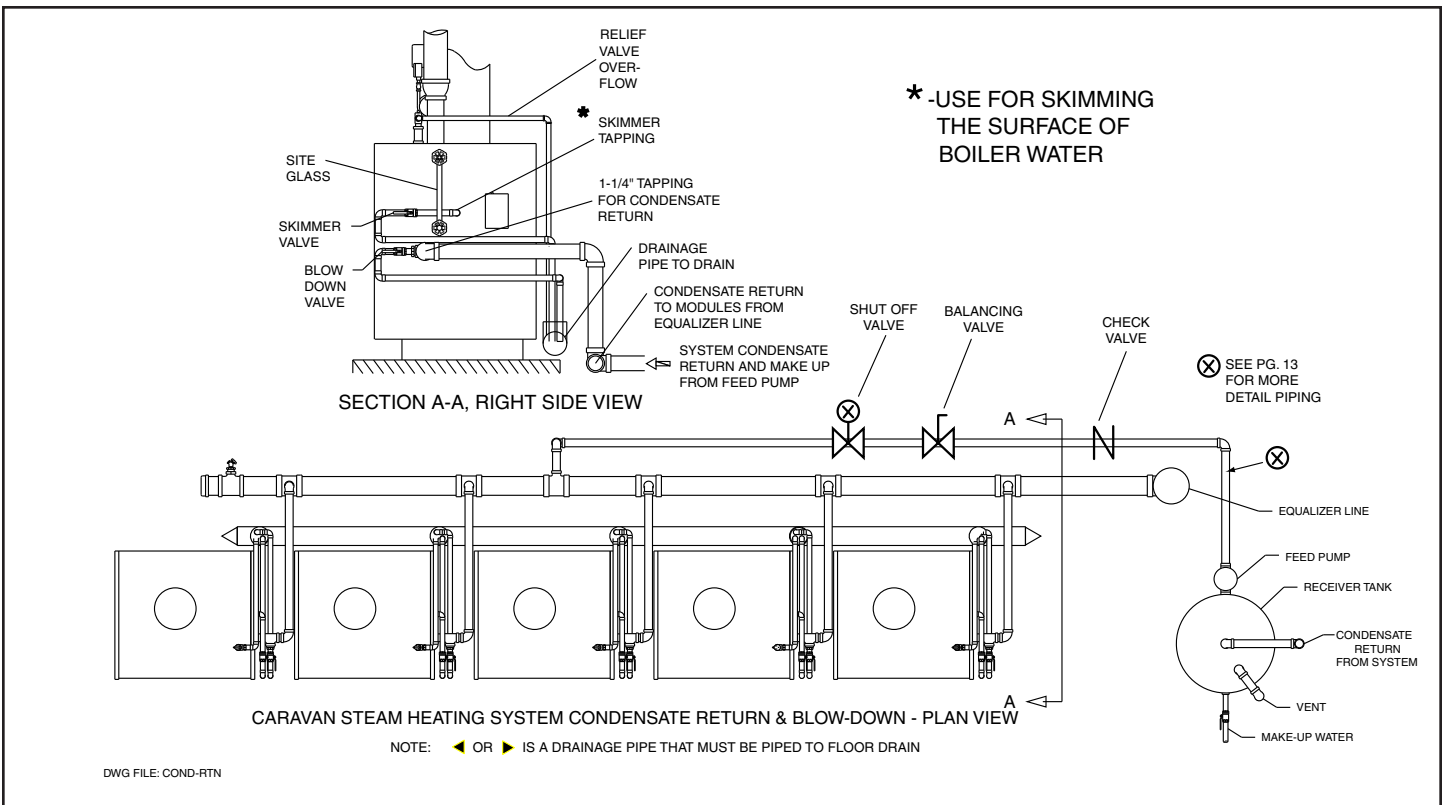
Typical Caravan GXHT-1500 steam return piping, elevation view
